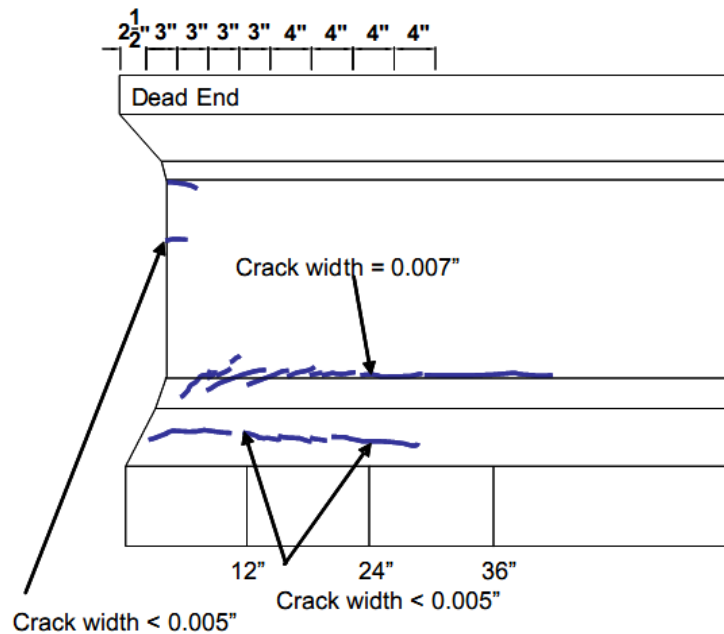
Typical crack pattern with widths (O'Callaghan, 2007)
